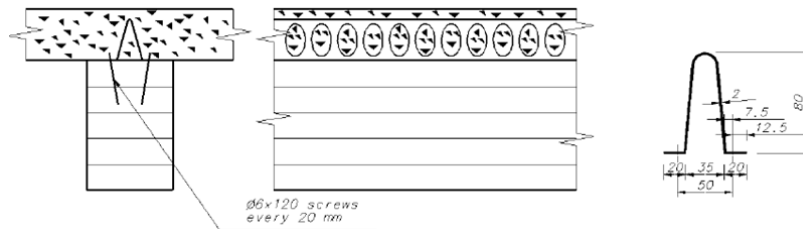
bent and perforated steel sheet fixed to the timber with screws (after Piazza and Ballerini 2000) (dimensions in mm)
